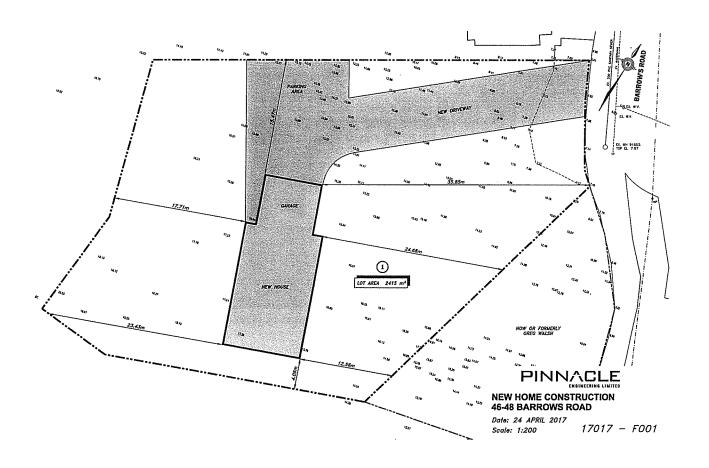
Proposed dwelling footprint showing lateral distance of the exterior walls with respect to the consolidated Lot boundary.
